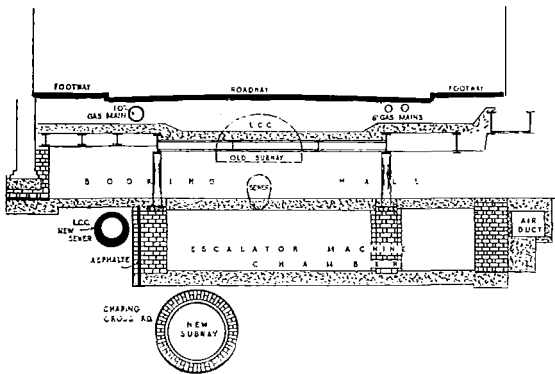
CROSS SECTION OF CHARING CROSS ROAD.
